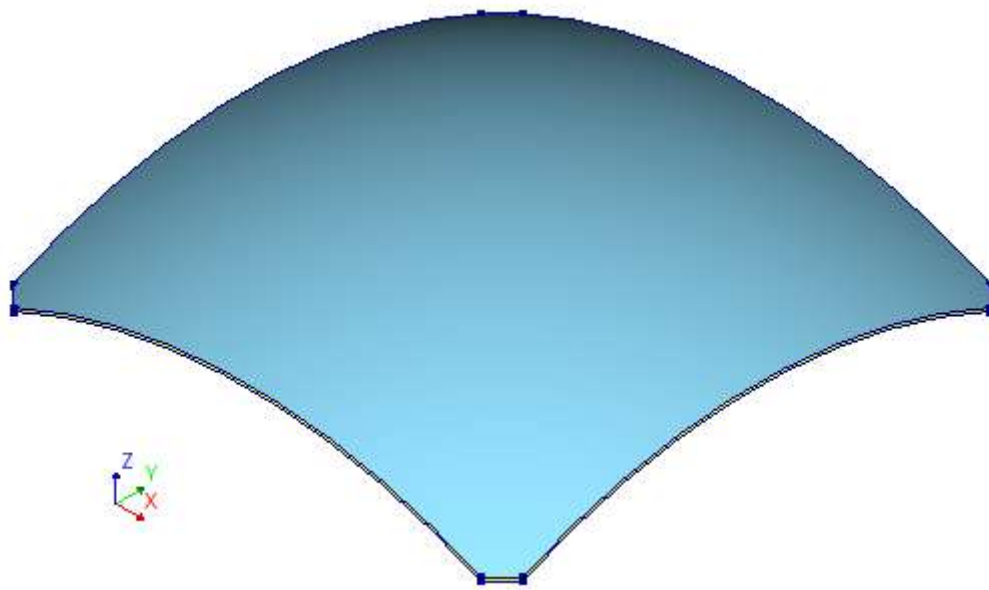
Shell model Tile vault and Composite Tile – Concrete Sail Dome.
